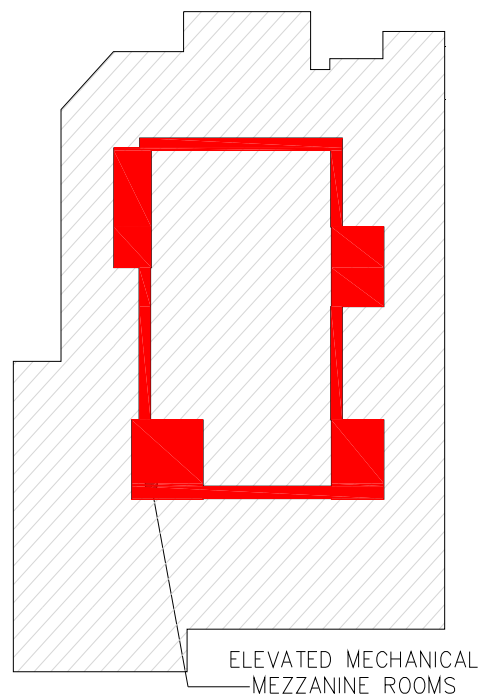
Elevated Mechanical Mezzanine Room Location
